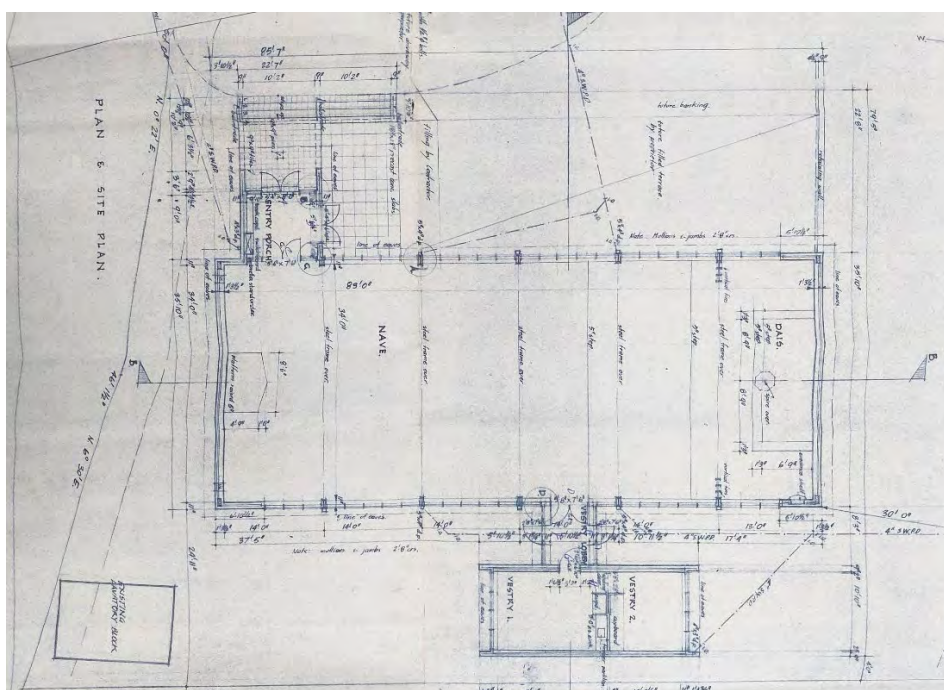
Plan of the church by architect Keith Reid, September 1959 (PROV, PB file)
